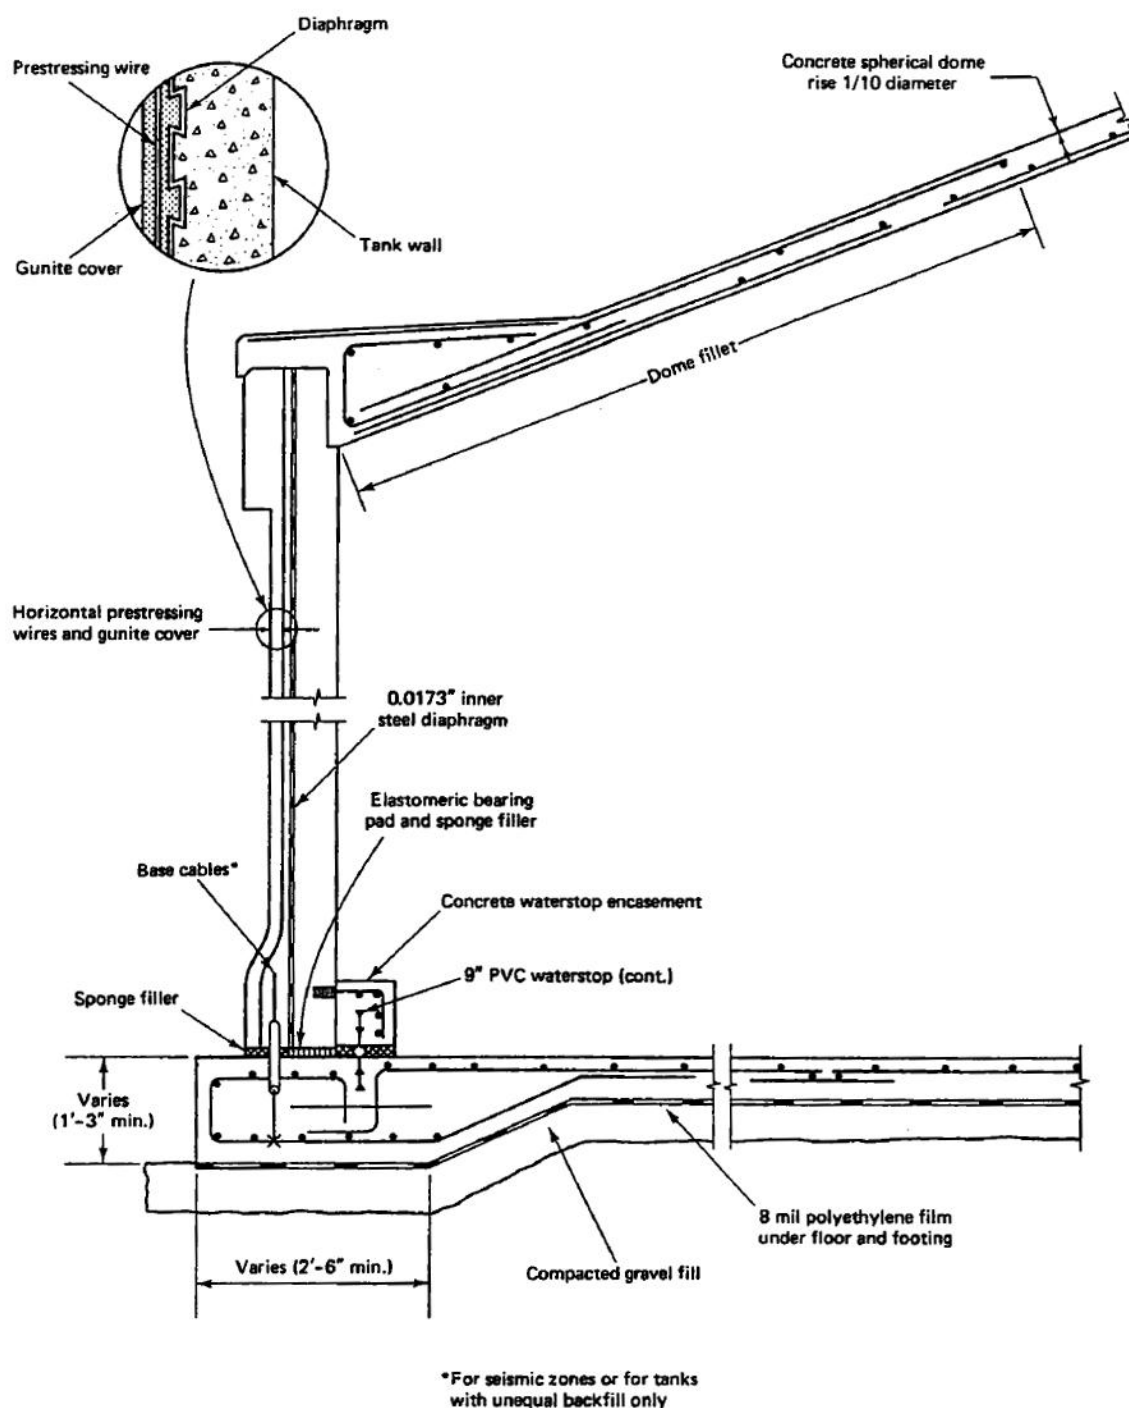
Typical tank section of a domed preload prestressed concrete tank with an inner steel diaphragm. (Courtesy, Preload Technology, Inc., New York.)
